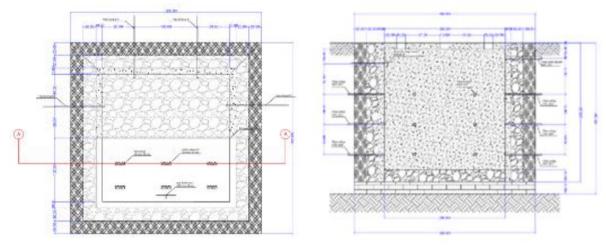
Infiltration Well Planning Layout Source: Author, 2023
